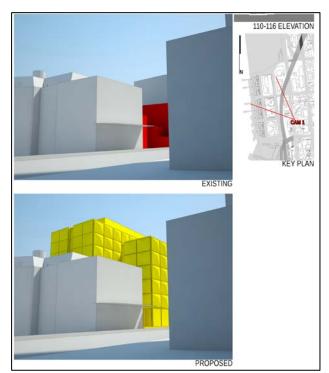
View looking west across Sussex Street showing Bristol Arms Hotel and subject site indicated in red
